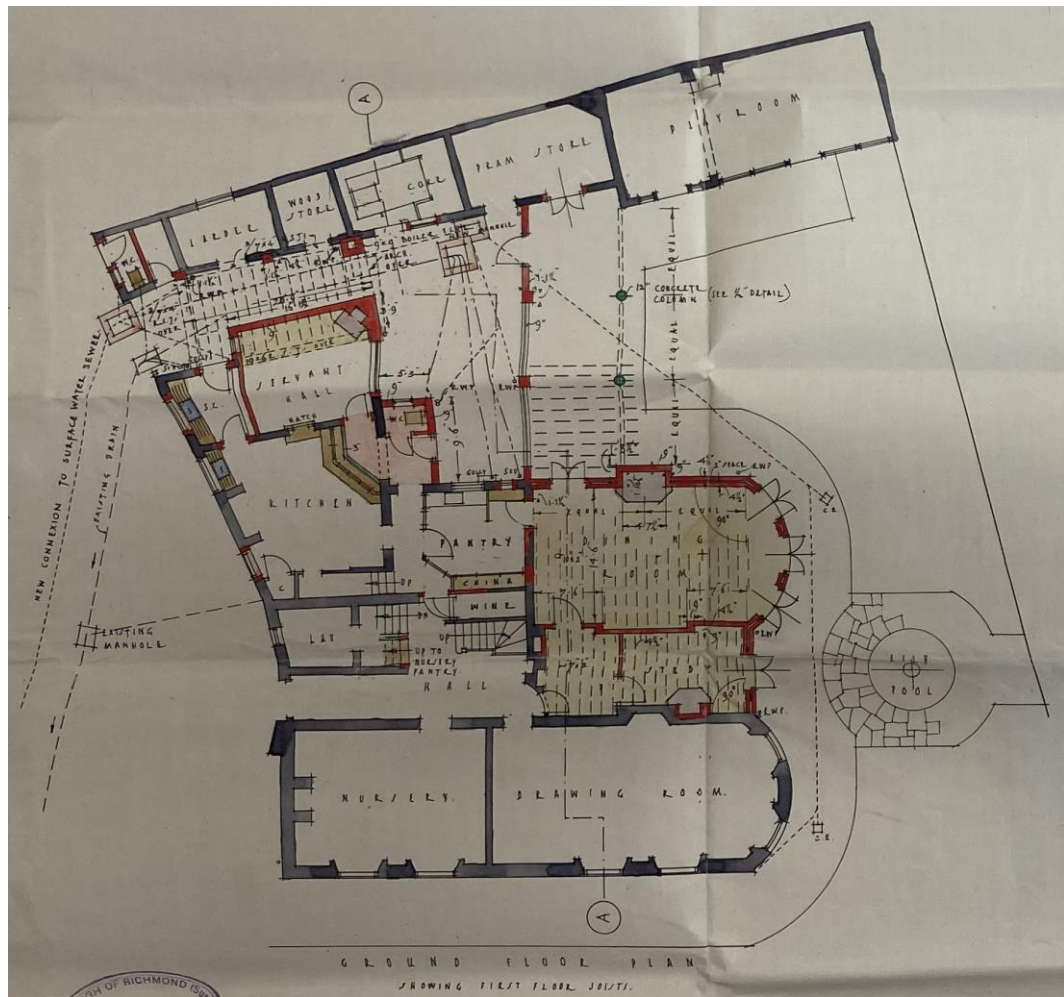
Proposed Ground floor of Avenue Lodge, 1933
